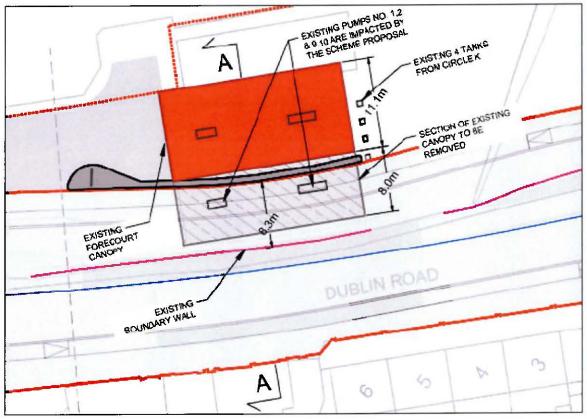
Revised forecourt arrangement post construction (Source: NTA, 2024)
